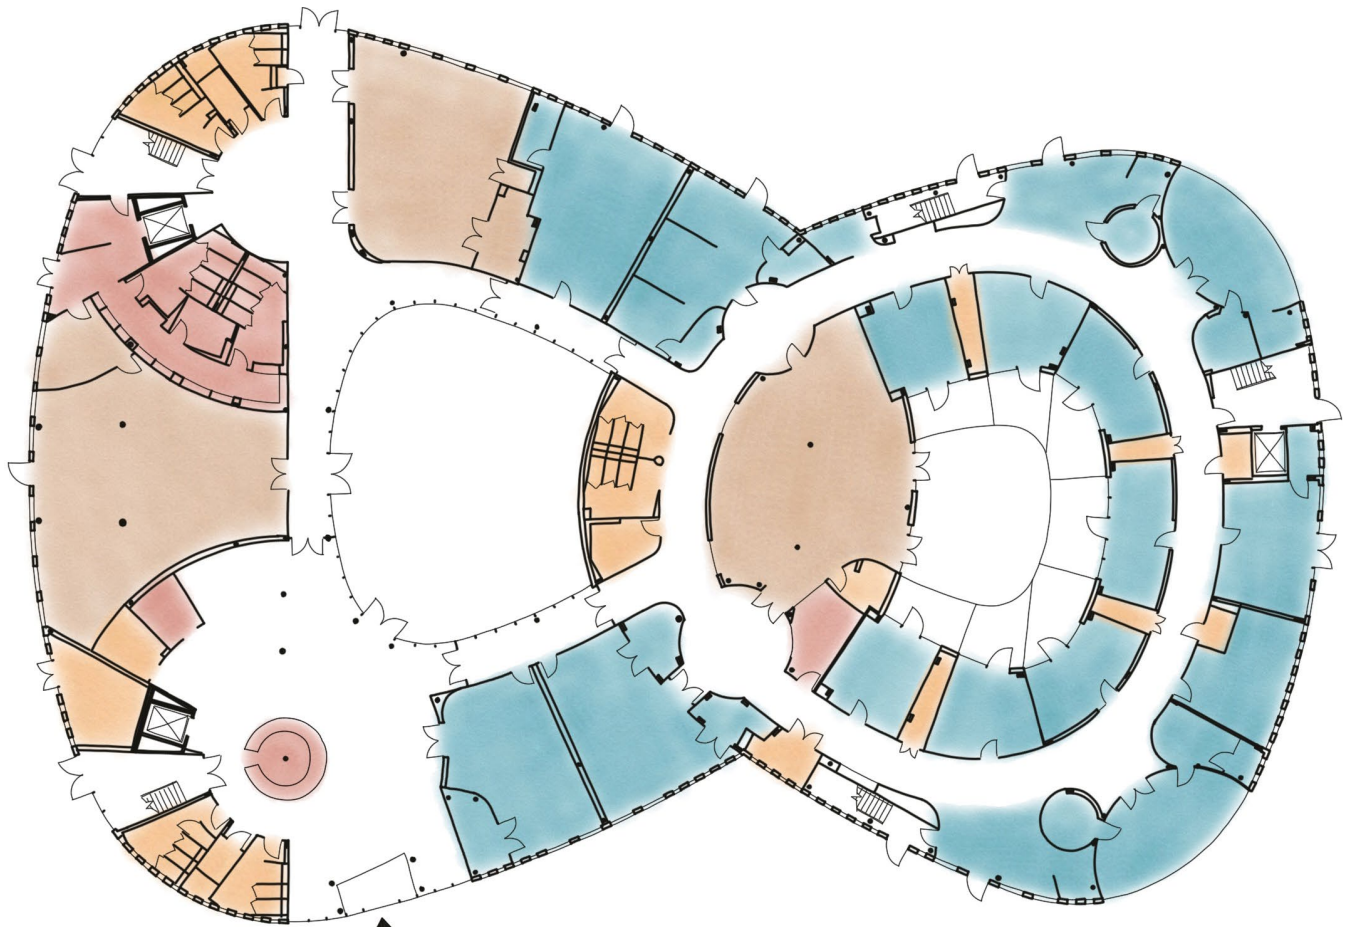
Ground Floor Plan of Caudwell International Children's Centre
